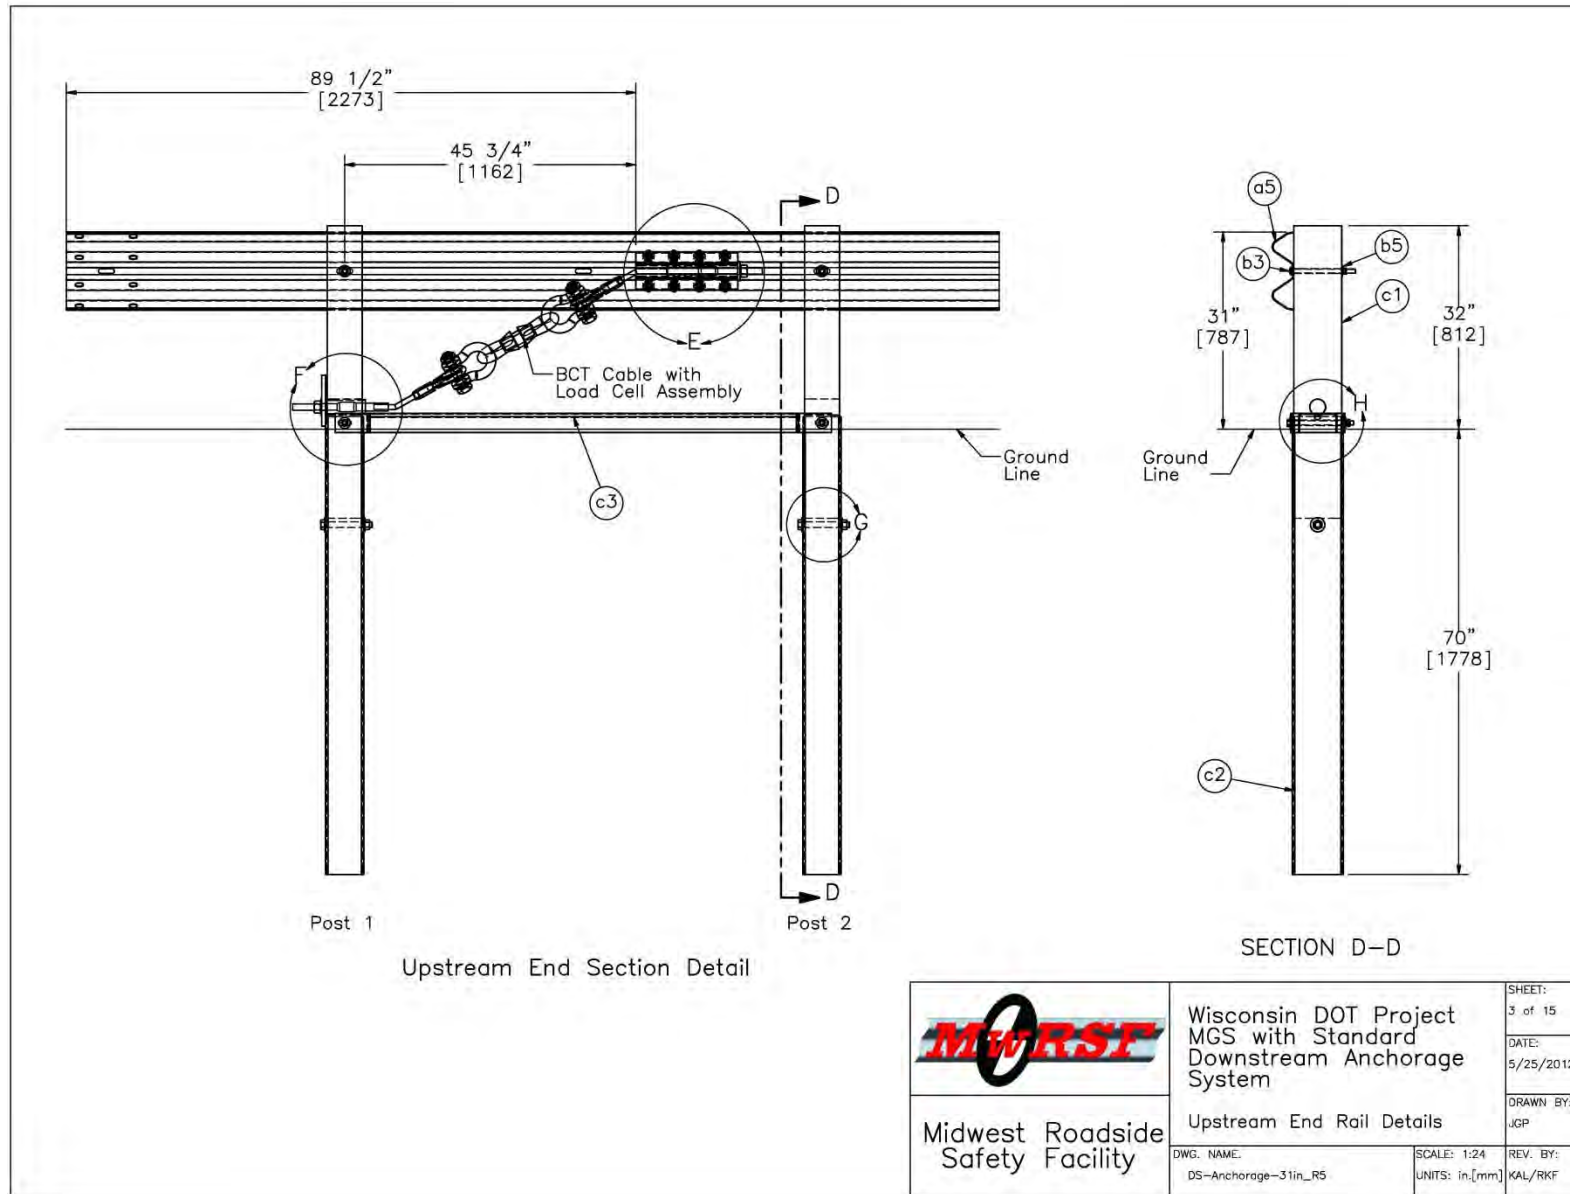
Upstream End Anchor Details, Test No. WIDA-1
